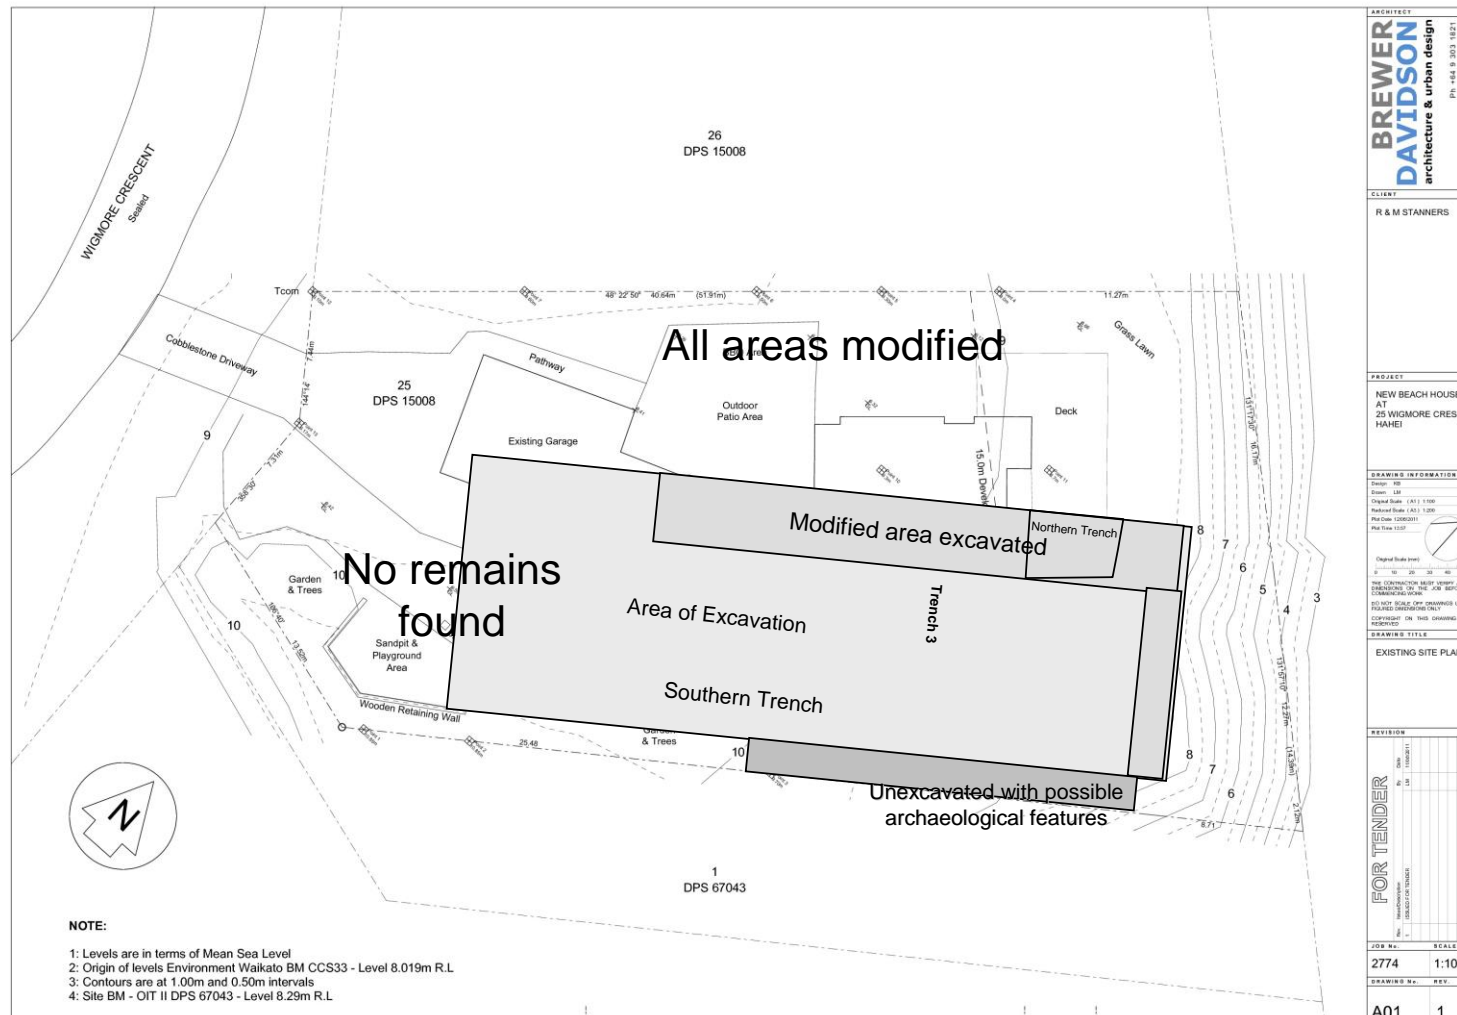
Existing site plan (source: Brewer and Davidson, 2011), with overlay of area of excavation
